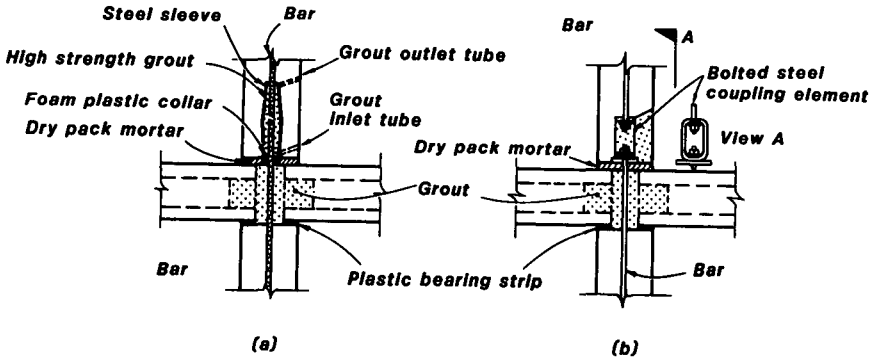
Further Horizontal Joints for Prefabricated Wall Panels [24].
